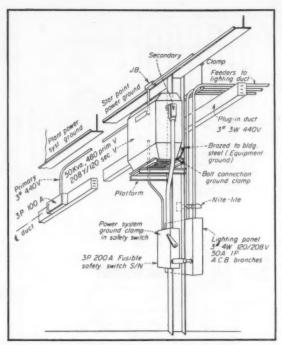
Lighting transformers are platform-mounted to structural H-columns at load centers, with primaries connected through plug-in breakers to 440-volt ducts, and 208Y/120-volt secondaries dropping down to 3-phase 4-wire panels.
